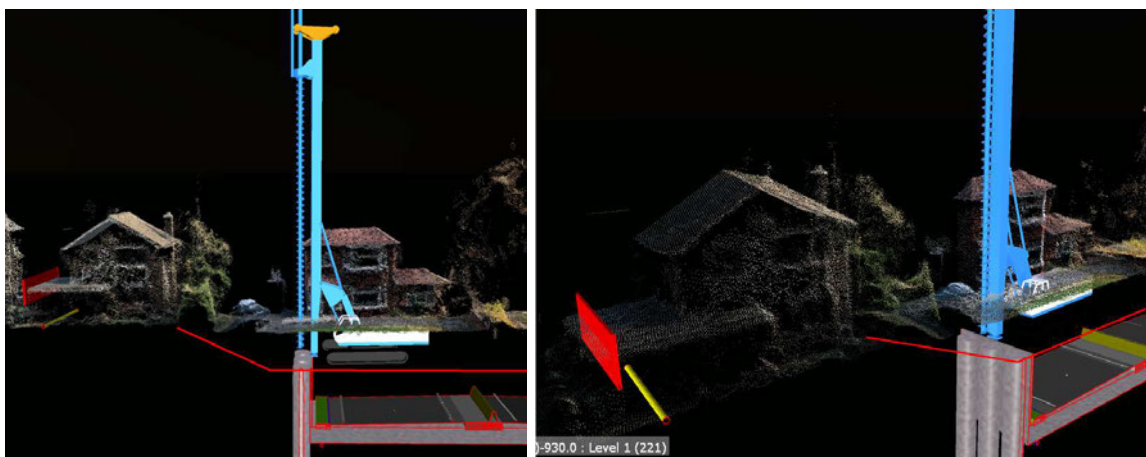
Indicative piling arrangement at 21A Old Road
